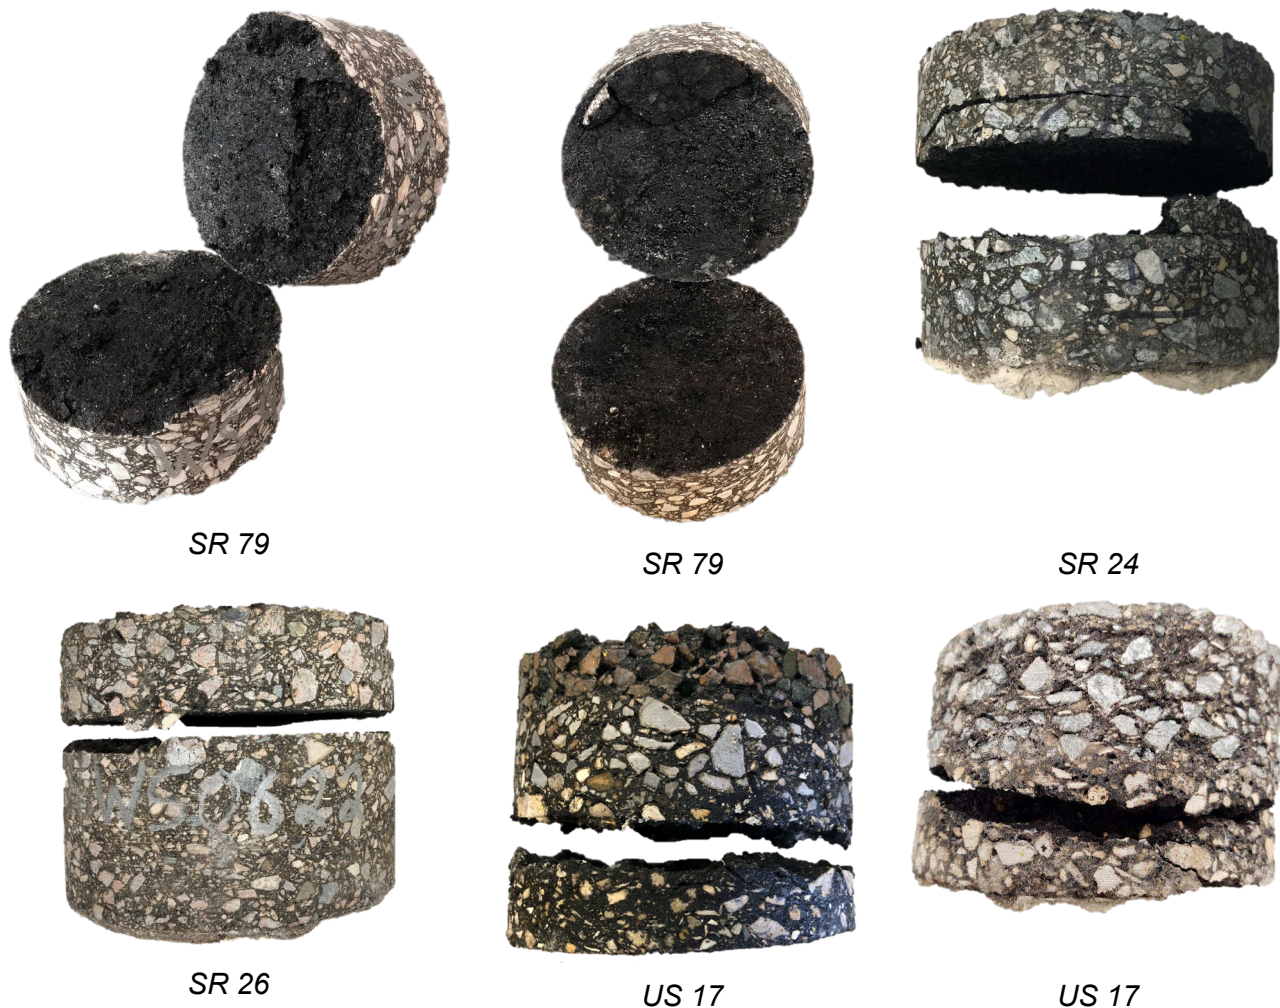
Additional Examples of Failures outside of Interface on Roadway
